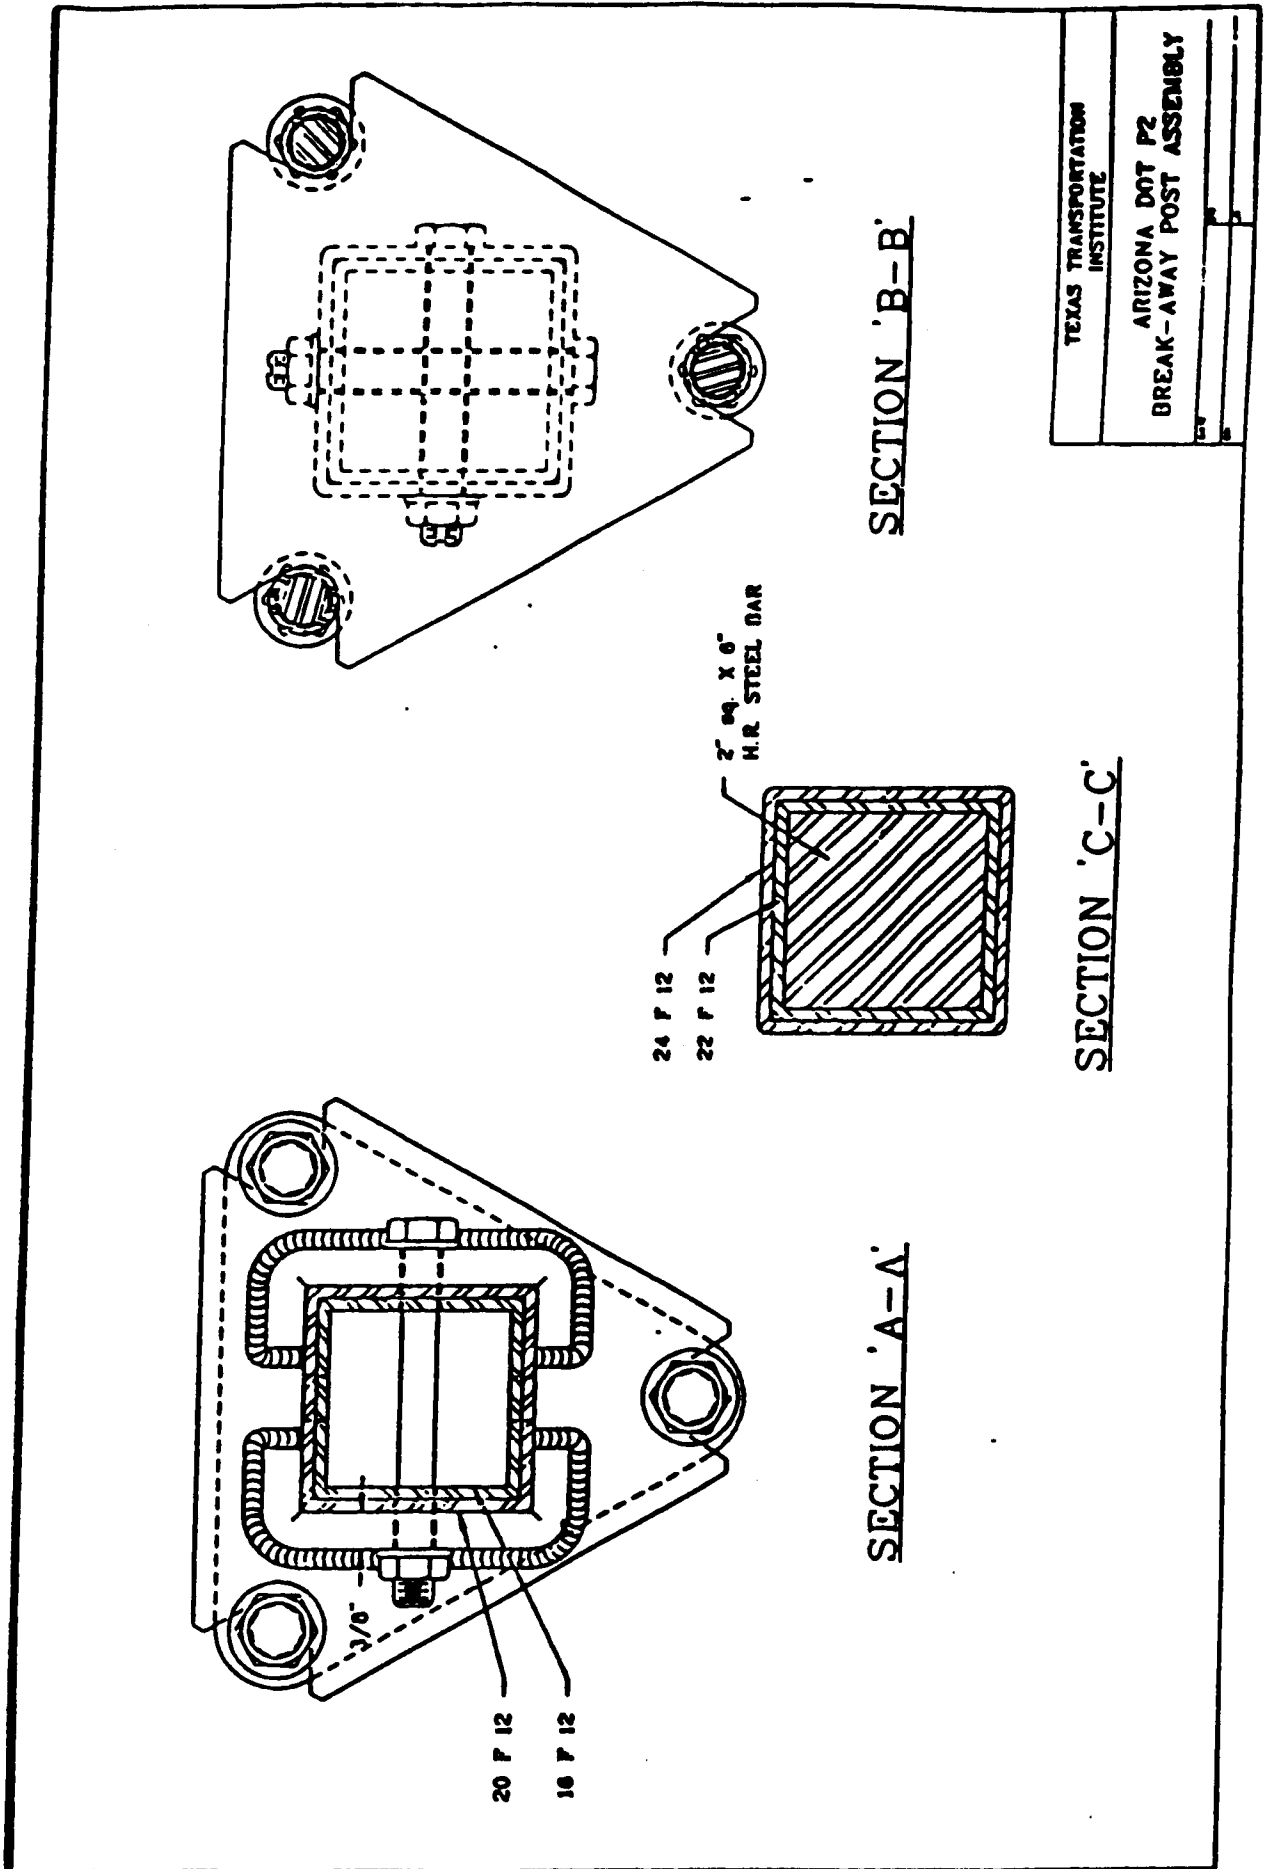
A. DETAILS OF SIGN INSTALLATION FOR TEST 7024-29 AND 7024-30
